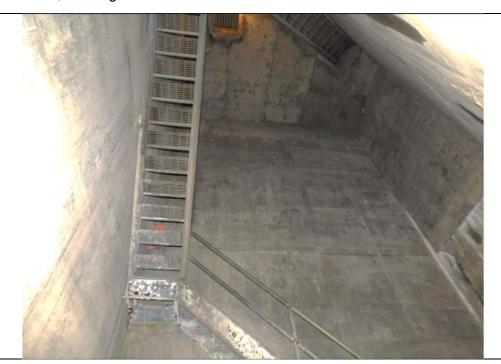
[Pier 4 Interior] -Basement Level, Room 1W, access staircase with moderate degradation of galvanizing and minor spot corrosion, Looking South
